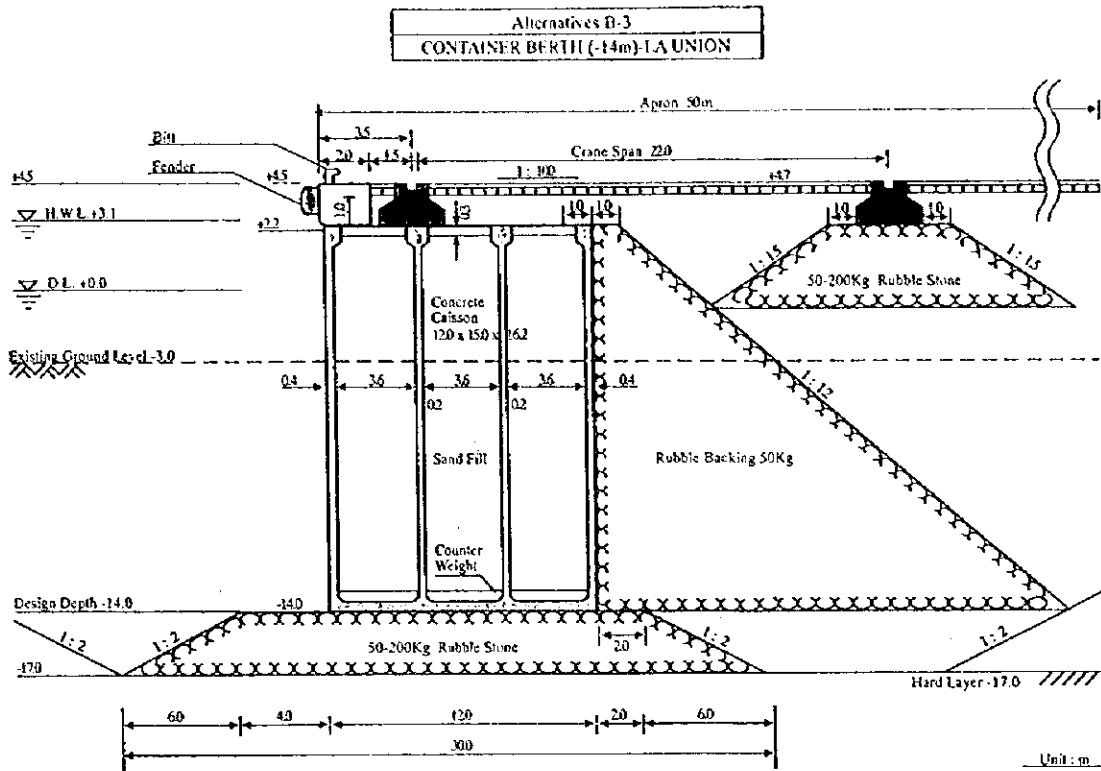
Concrete Caisson Type Container Berth (-14m)
